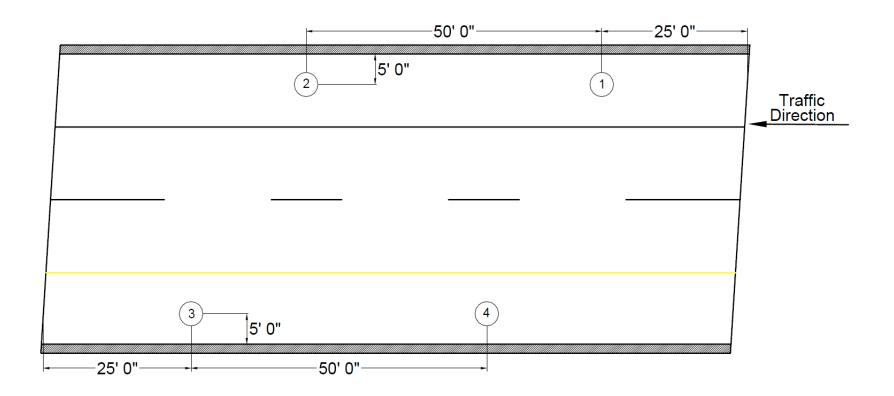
Testing locations in shoulders of 8200 South bridges.
